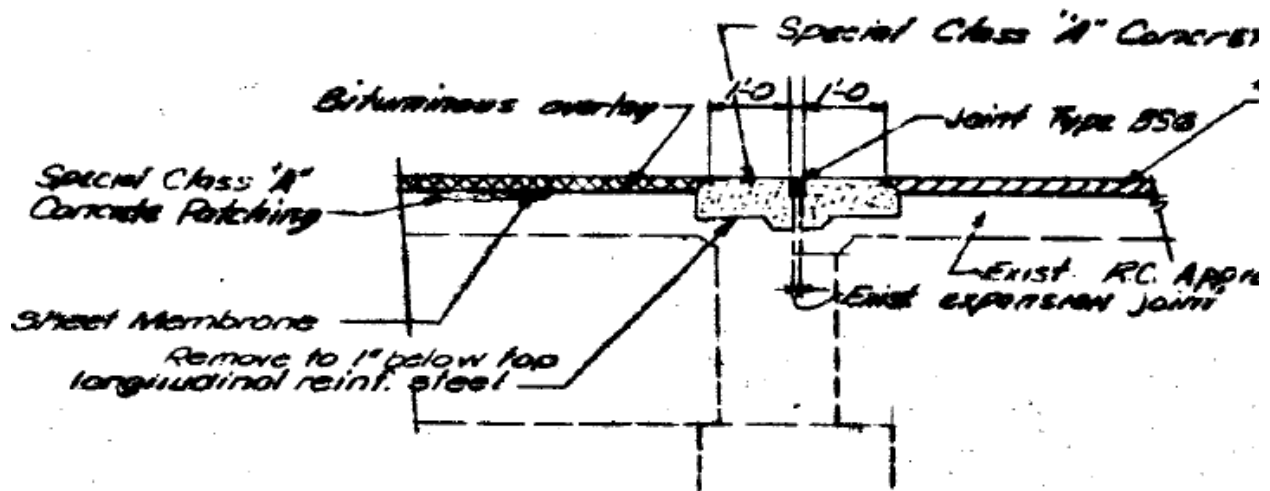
Abutment Detail of the Bridge (NBI 32200) (1974)
